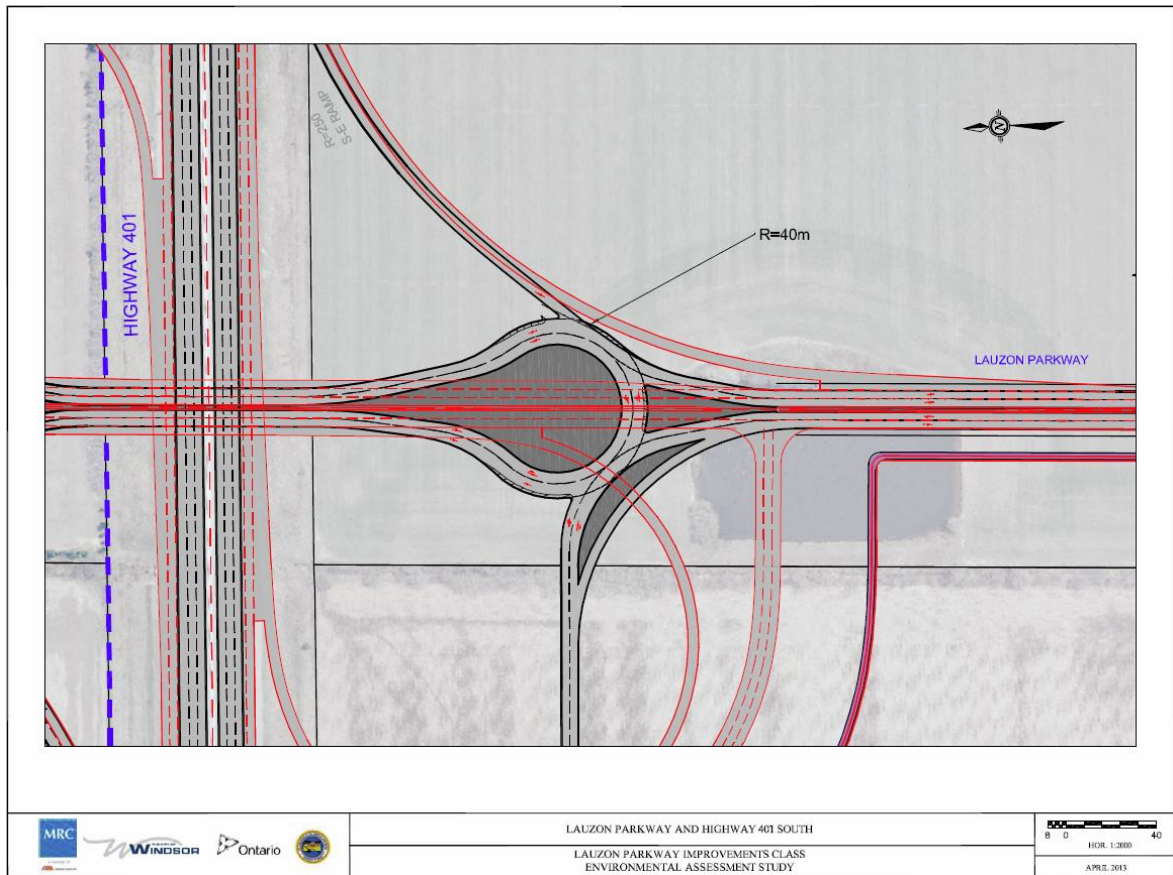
Lane Configurations with Teardrop Roundabout at Lauzon Parkway/Highway 401 South Ramp Terminal
